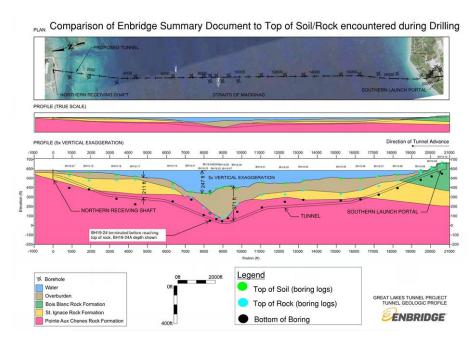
Plan view of proposed tunnel alignment spanning the Straits of Mackinac, as well as geotechnical boring locations and cross-sections at 5x vertical exaggeration (bottom) (Technical Memo from McMillen Jacobs Associates, 2021; DEIS Figure 4.14-1). Note the number of borings that do not penetrate to the full tunnel depth (12 of 21).
